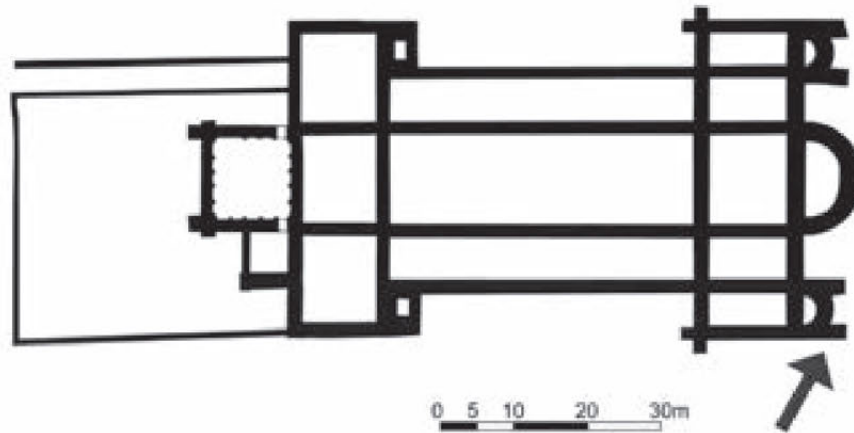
Liège Cathedral, ground plan (reconstruction Marcel OTTE et al.)
